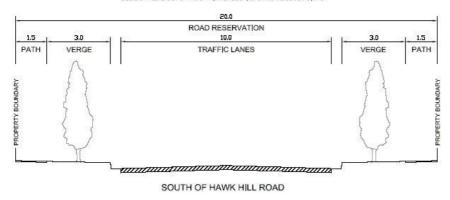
(a) Port Sorell and Environs Street Cross-section designs - Alternative access route
